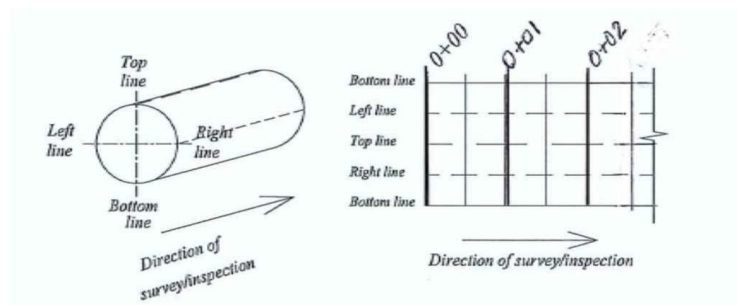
Unrolled Duct Surface in the Grid on Inspection Form
